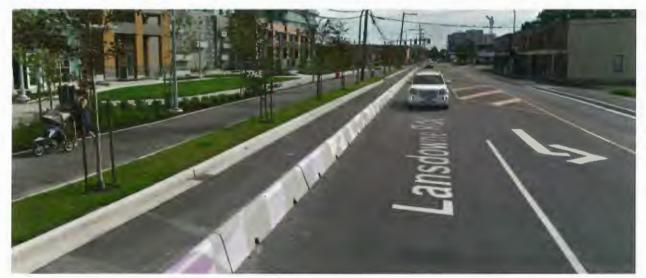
Lansdowne Road Extension between Minoru Blvd and Alderbridge Way
